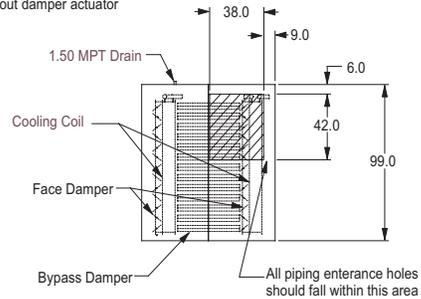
Cooling Coil with Face & Bypass Damper - Staggered
